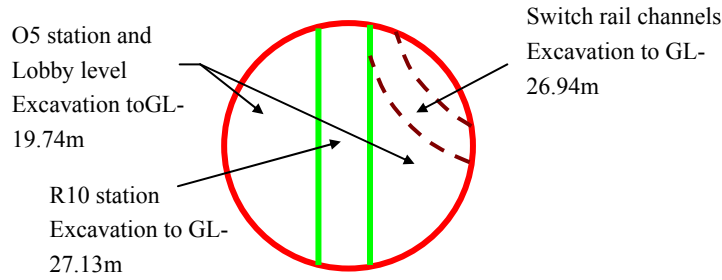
Circular diaphragm wall internal bottom excavation elevation
